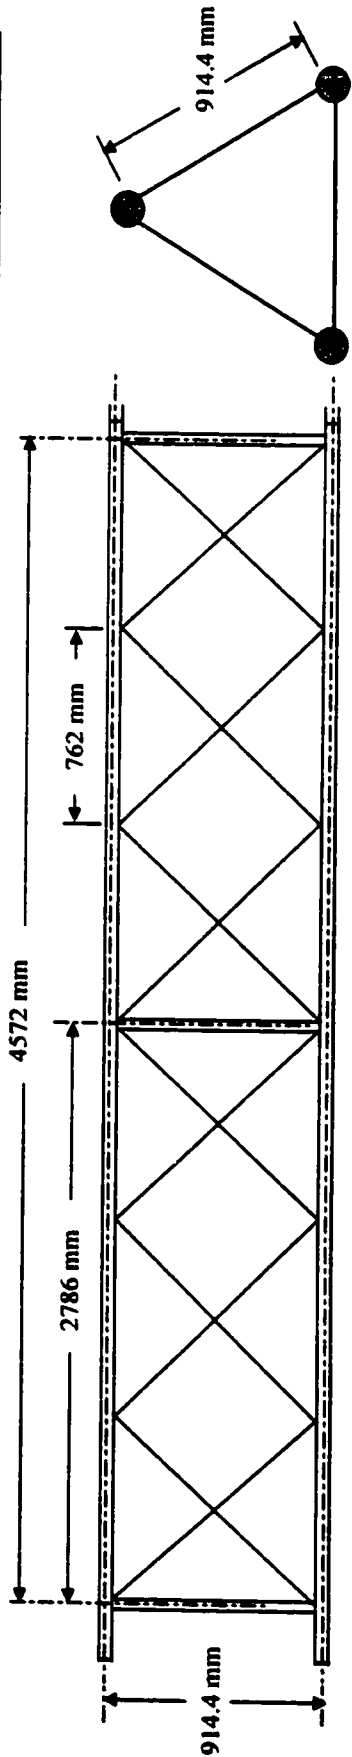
DIMENSIONS OF 6-PANEL SPECIMEN
